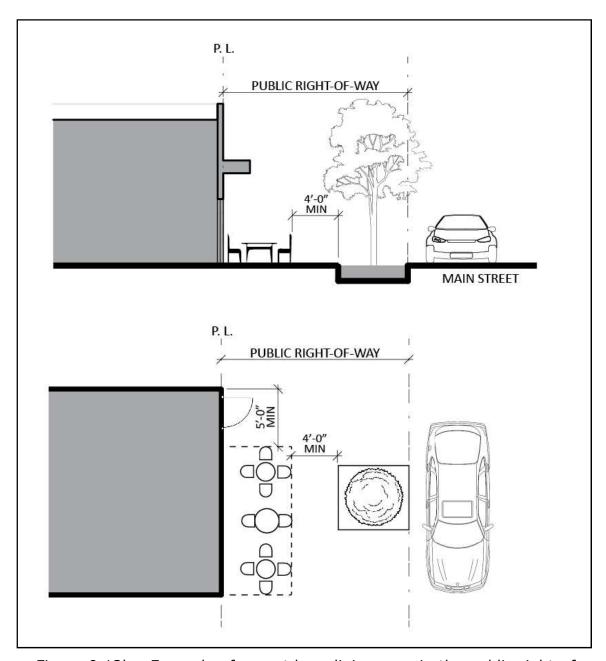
Example of an outdoor dining area in the public right-of-way abutting a storefront wall without a barrier.
